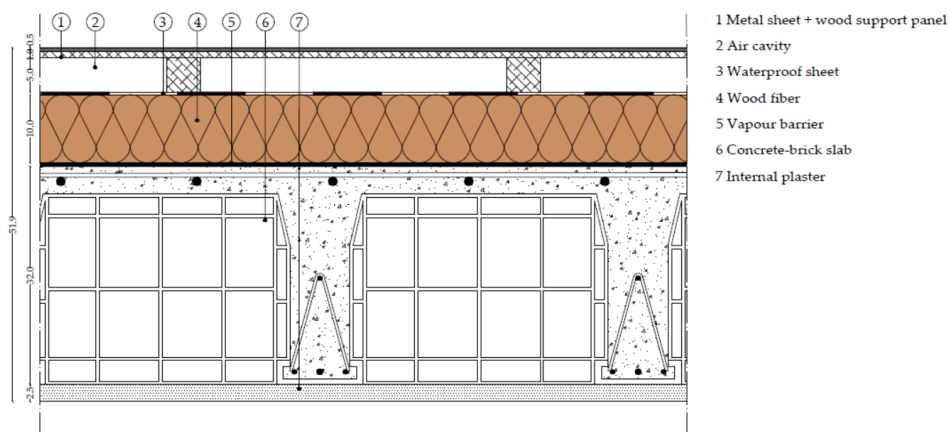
Scheme of roof layers for reinforced concrete structural solution
